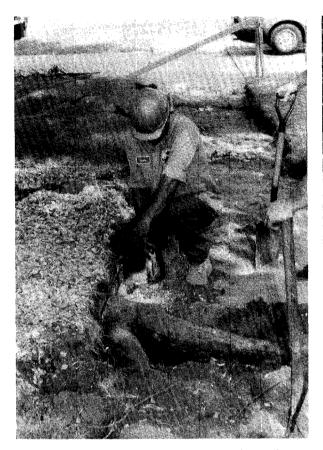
Removal of surface roots from a parkway elm underneath a public sidewalk that is being replaced. The sidewalk was raised and was hazardous to pedestrians.
